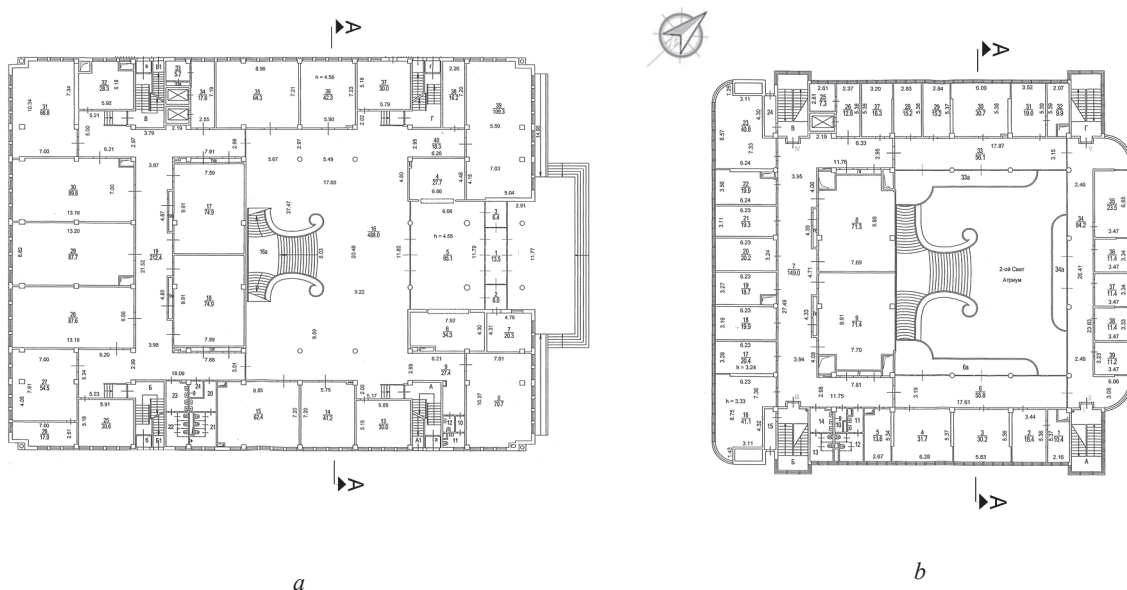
Outlines of the ground floor and five floors of the atrium building: *a* — ground floor; *b* — five floors
